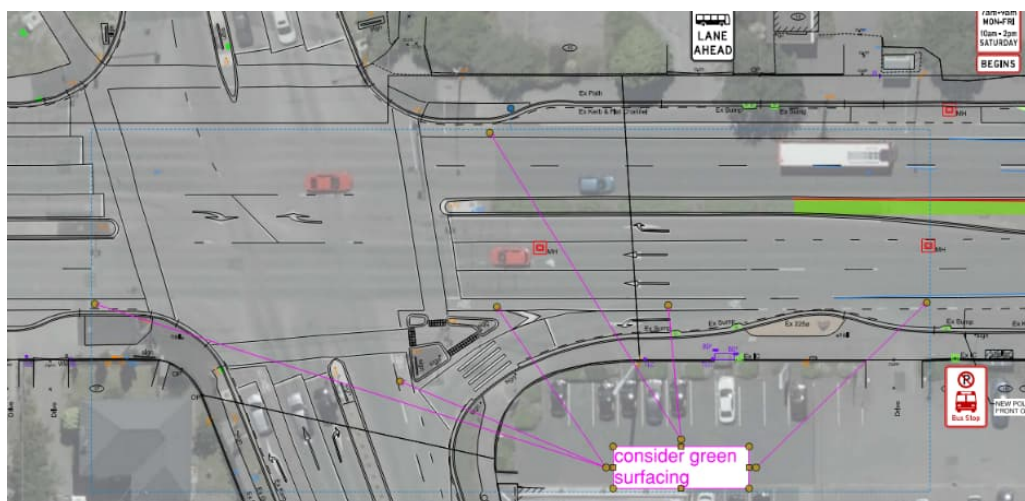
Locations that would benefit from green surfacing at the Hoon Hay Road / Curlett's Road intersection as an example
